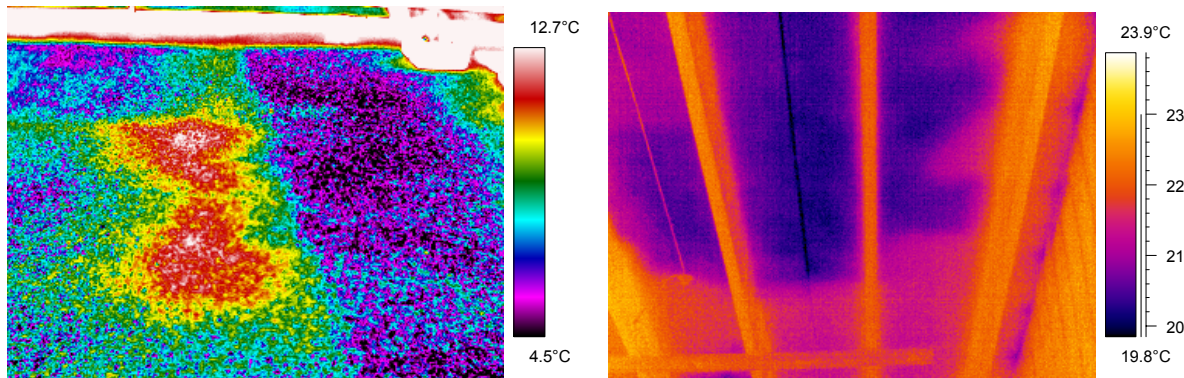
Moisture infiltrated BUR (Built-Up Roof) assembly on a low slope manufacturing facility in Cheyenne, Wyoming (left). Water-damaged roofing components and insulation identified from infrared scan from the underside of the built-up roof on a structural concrete tee deck (right).
